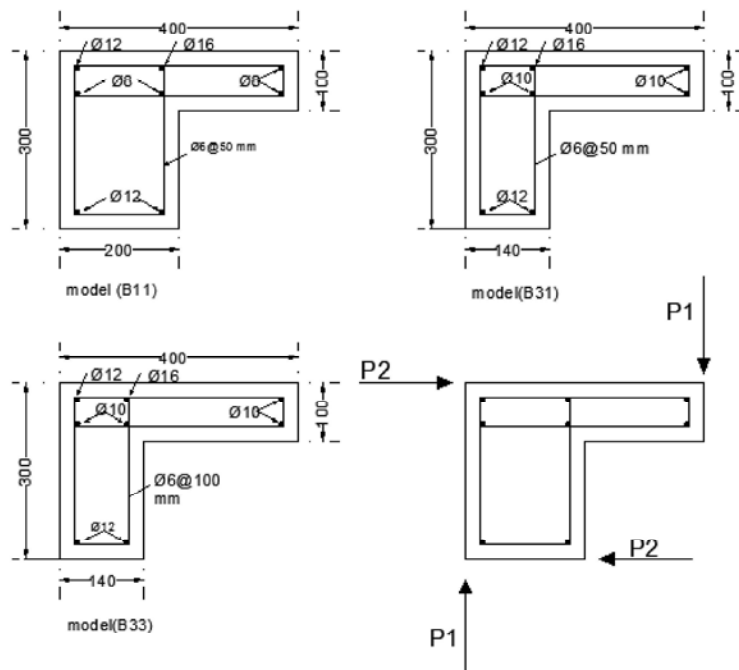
Details of the steel reinforcement and loading system for analysed beams.
